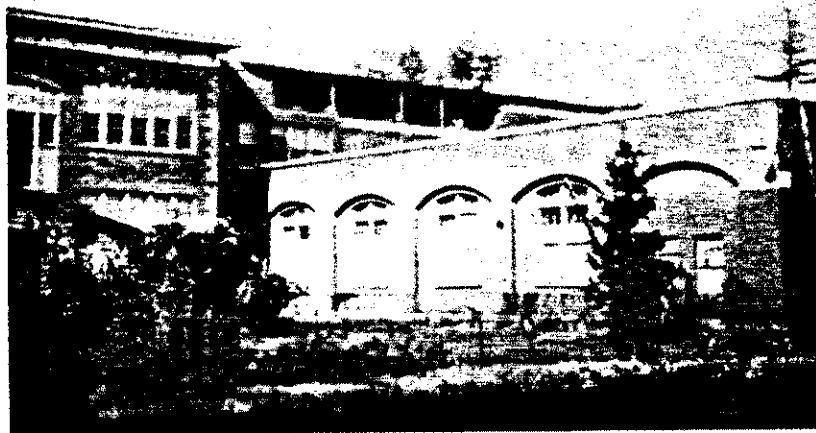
Damage at the Collegiate and Vocational School, Cornwall (Sweet 1944) — out-of-plane failure of masonry wall.
